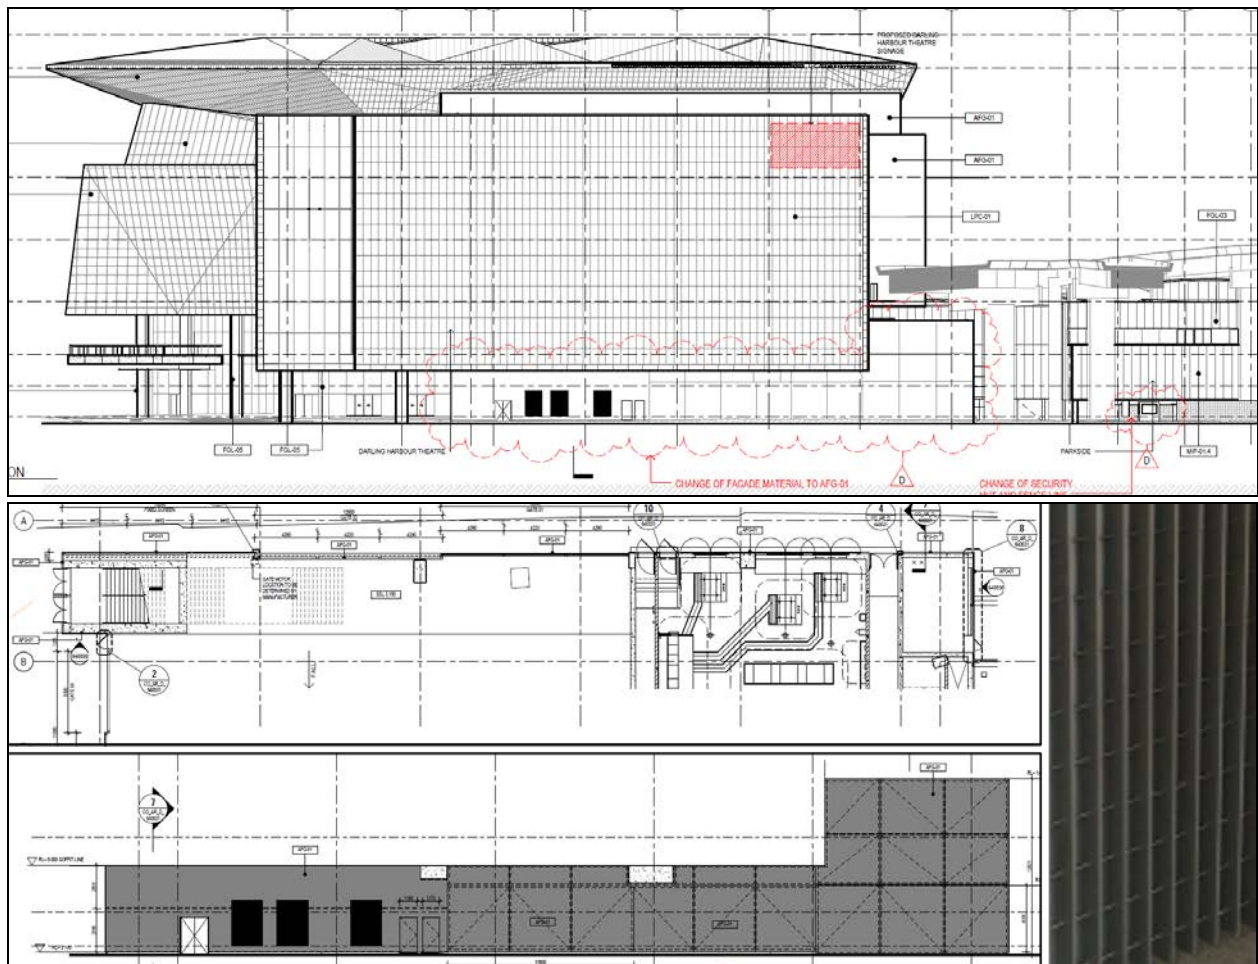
Western elevation of the Convention Centre and location and appearance of proposed metal screen architectural treatment (Source: applicant's EIS)
